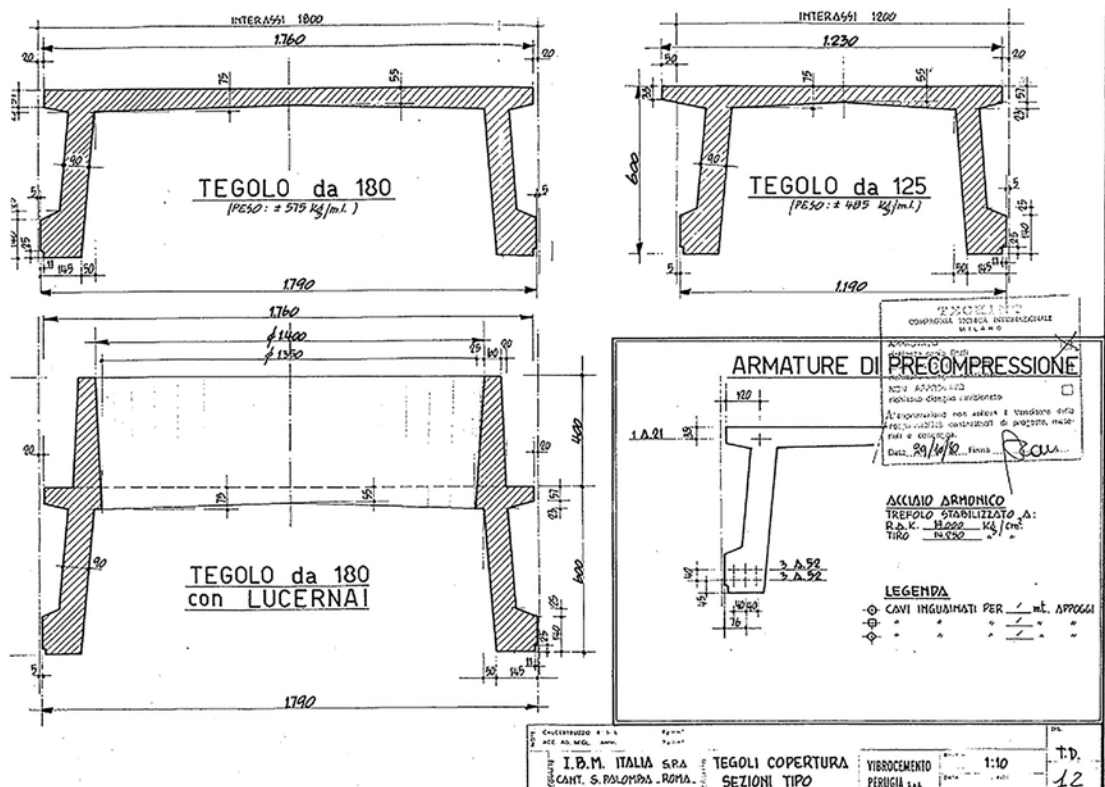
IBM Italia factory, a typical section of the roofing tiles. Source: courtesy Generale Prefabbricati S.p.A.
